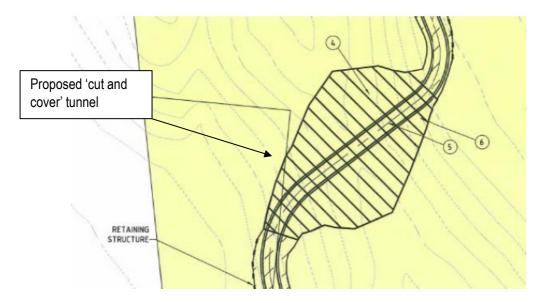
Plan indicating the area to be revegetated as part of the proposed 'cut and cover' tunnel.
